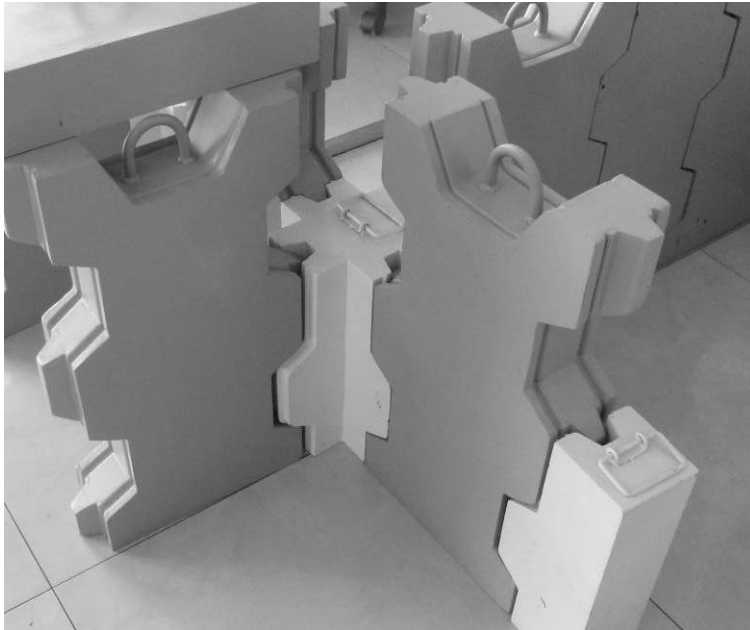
Model showing the precast wall panels (grey) and cast in-situ column sections (white)
